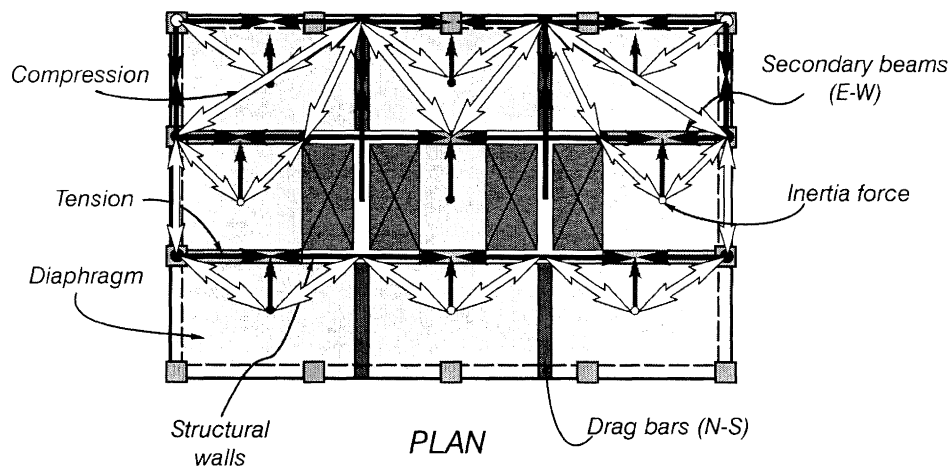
Strut and tie solution in combination with drag bars for a structural wall core building.
